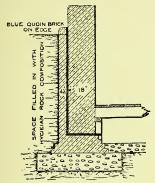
Hygeian Rock Composition in Hollow surface concrete after the brick footings. The concrete under footings are made from 6 in. to 12 in, thick. Care must be taken that the earth is nowhere in contact with the brickwork of the footings. The outside earth above the level of the concrete should 3" 3" ringbe kept away from the main wall by a retaining or breast wall, leaving a wide and open dry area, and in addition a cement plinth should be carried up the main wall as high as the damp-proof course. (See Fig. 101.) When the necessary space cannot be given, or other objections arise to an open dry area, a closed dry area may be substituted. This may be 12 in. wide, and the retaining wall vertical, with one set off at back. The space must be ventilated without allowing access for
